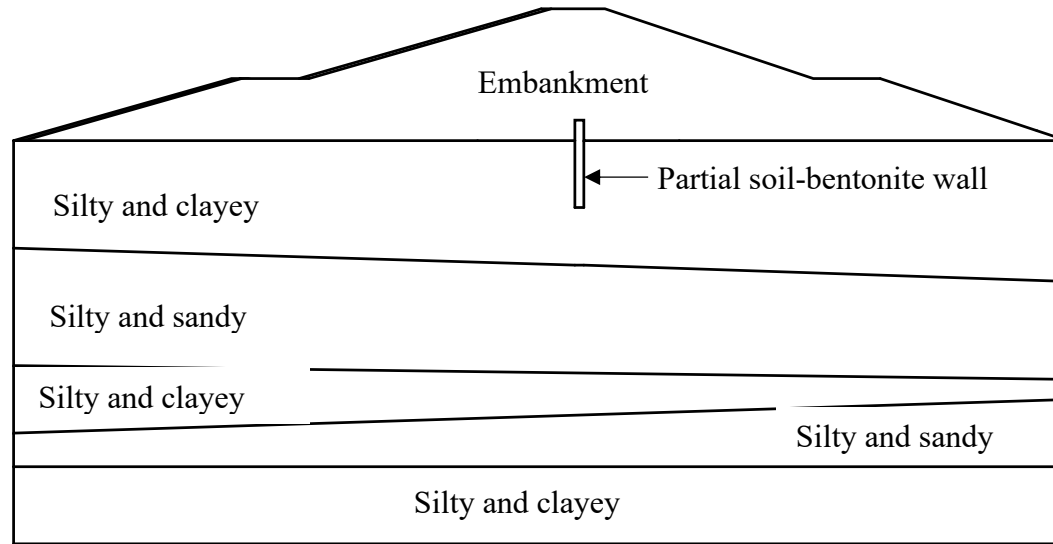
Soil-Bentonite Cutoff Wall Foundation Modification
